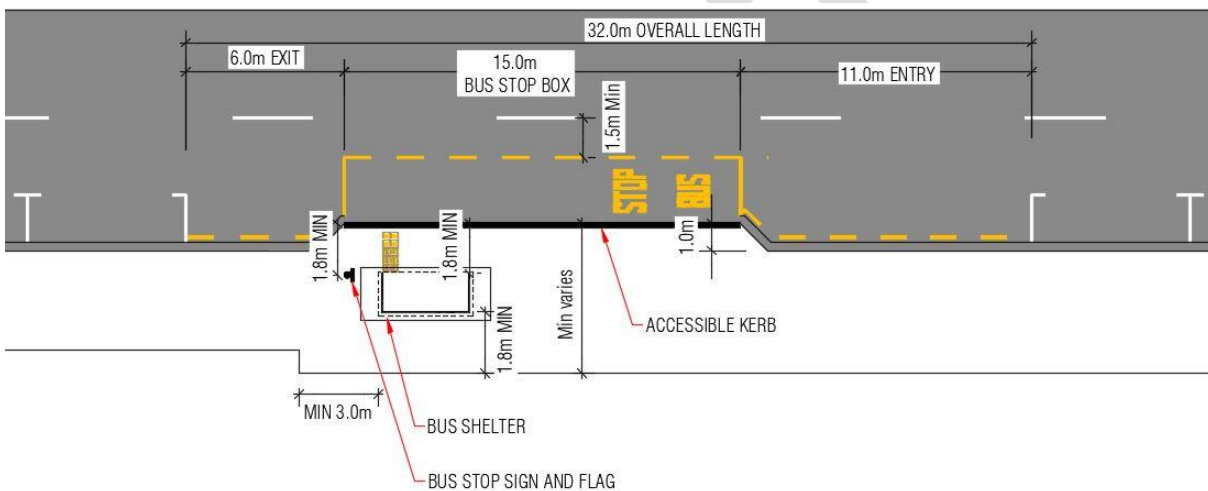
Half-width bus boarder – retrofit to existing street kerb line (alternative 2). Source: Adapted from Auckland Transport.
